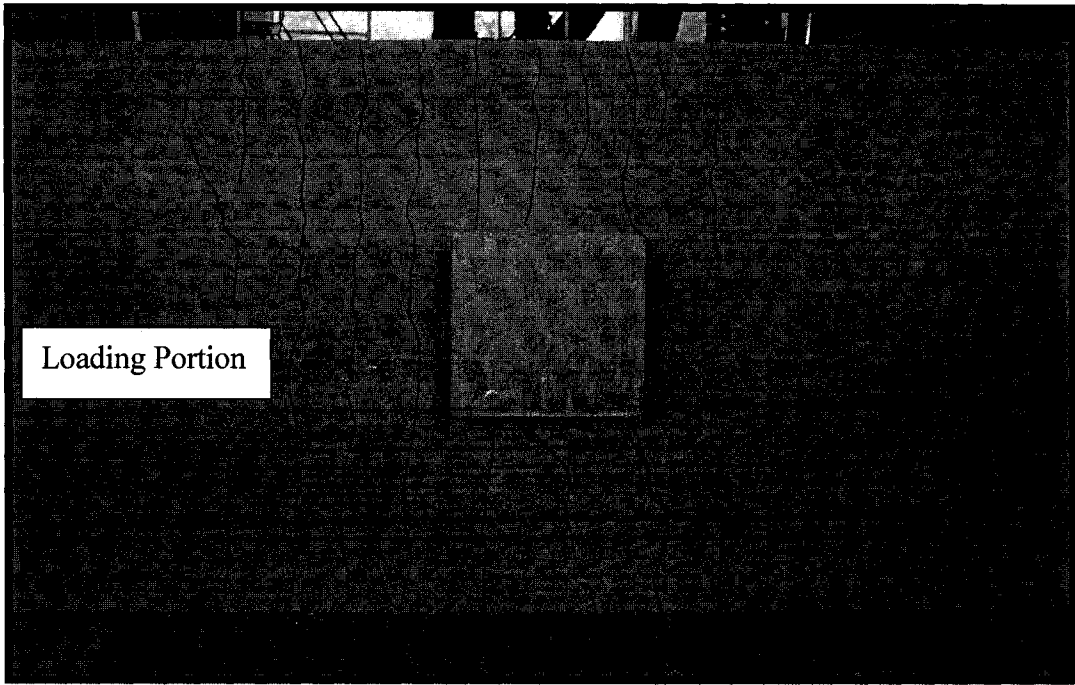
The cracked specimen (CRAK25) after releasing the load and transferring
